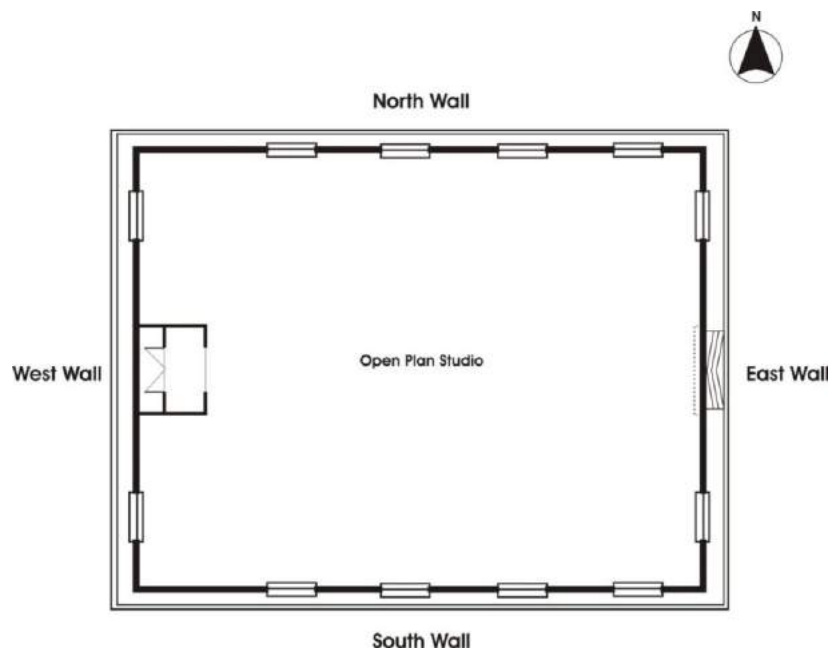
The basic layout of Studio 3, Industrial Design building
